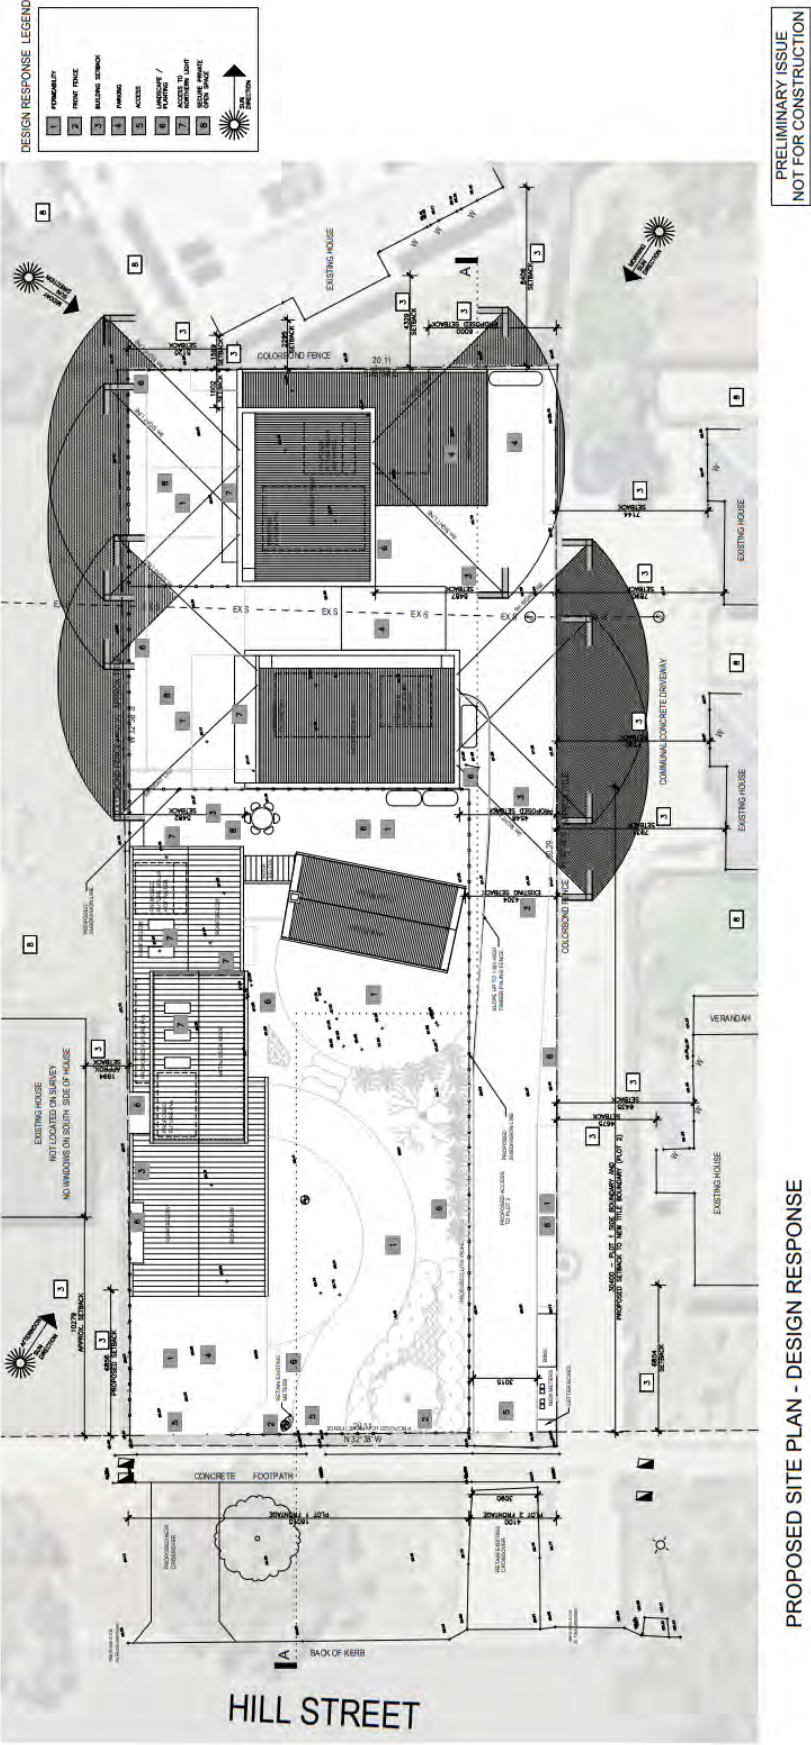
Previous application (DSD/110/2018) Proposed Site Plan
